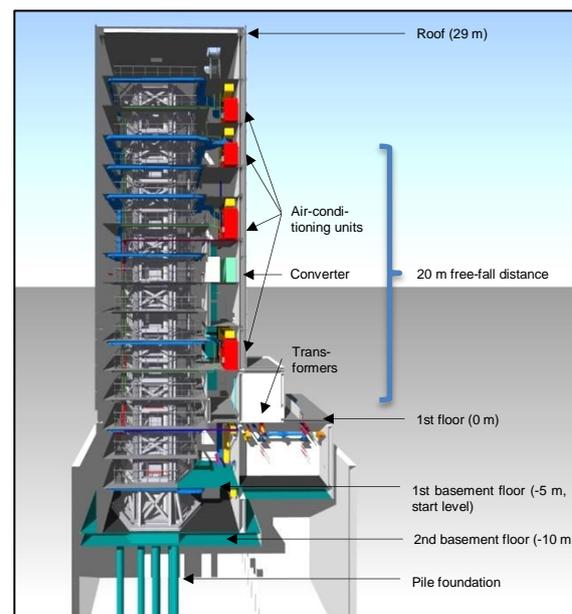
Side view of tower-in-tower construction with arrangement of air-conditioning units and rooms for transformers and converters
